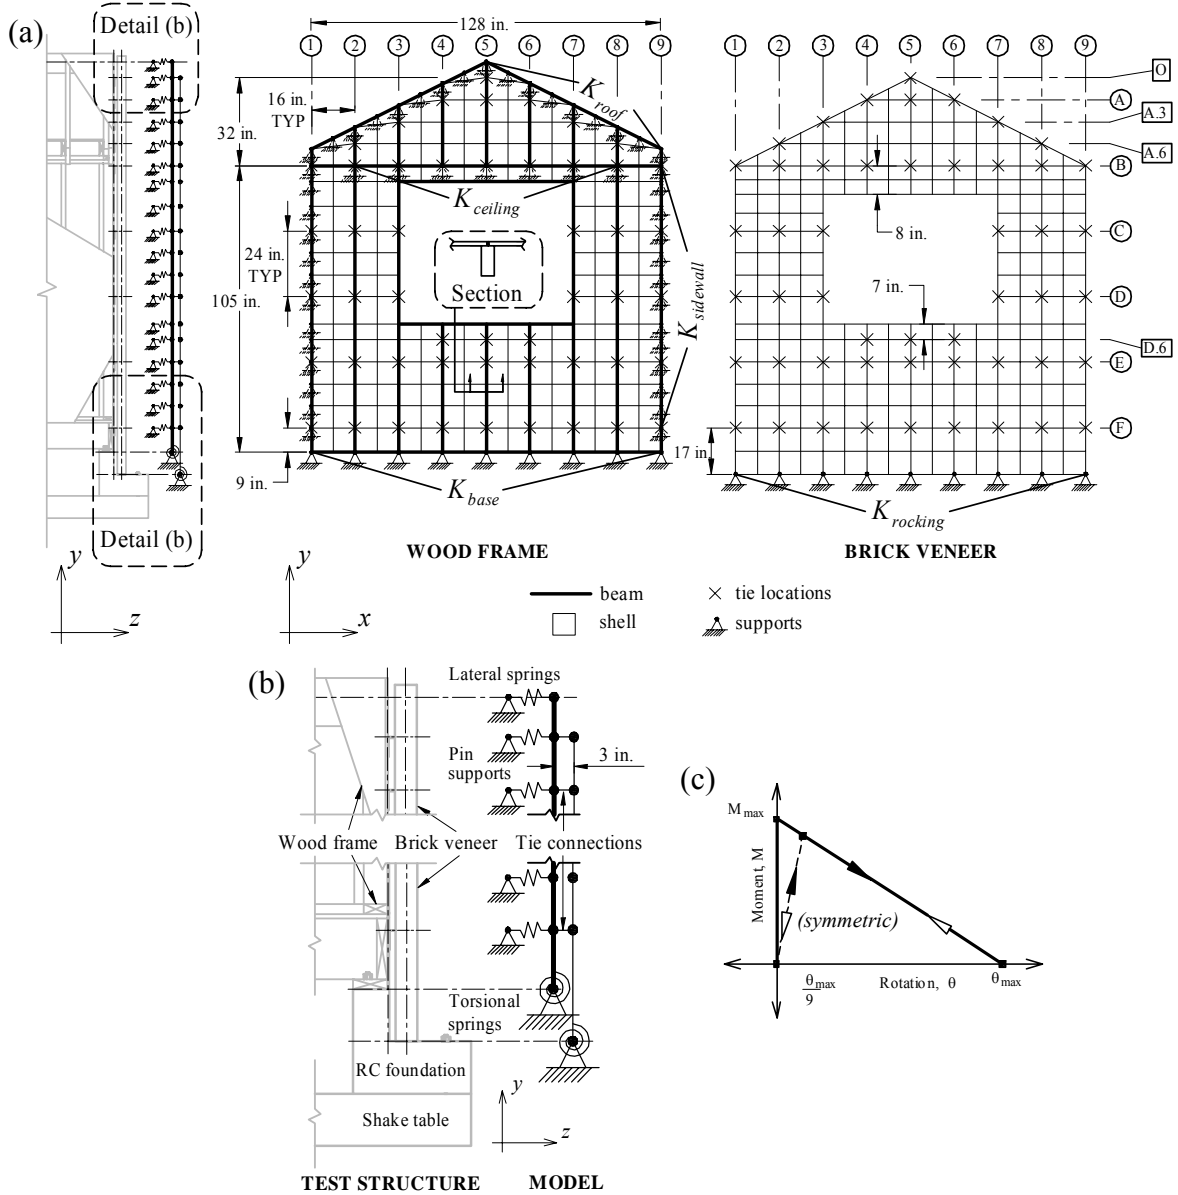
(a-b) FE wall model geometry and support details, and (c) bi-linear elastic brick masonry rocking behavior model.
